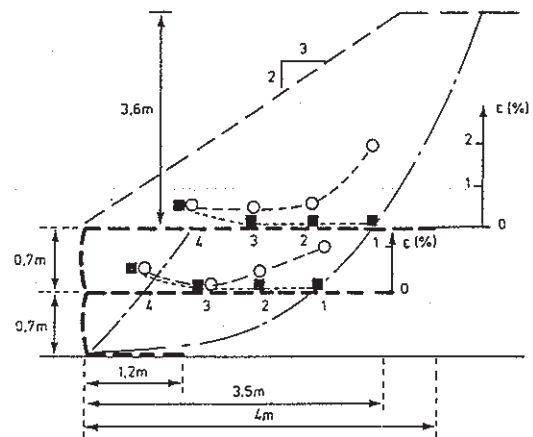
La Houquette embankment. Deformations of geotextile during construction:  $h = 1.4 \text{ m}$ ,  $h = 4 \text{ m}$ .
